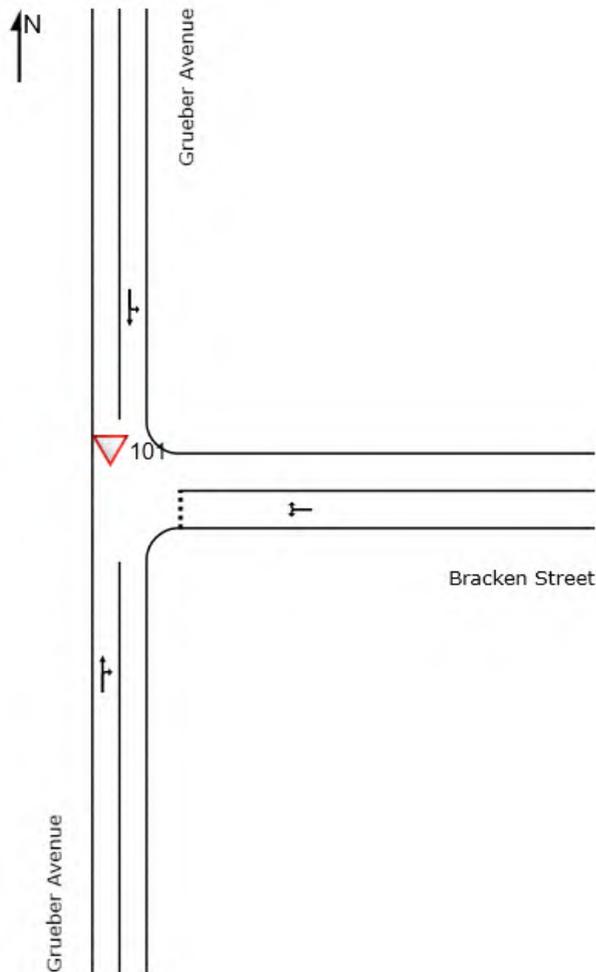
Grueber Avenue/ Bracken Street Intersection Layout
